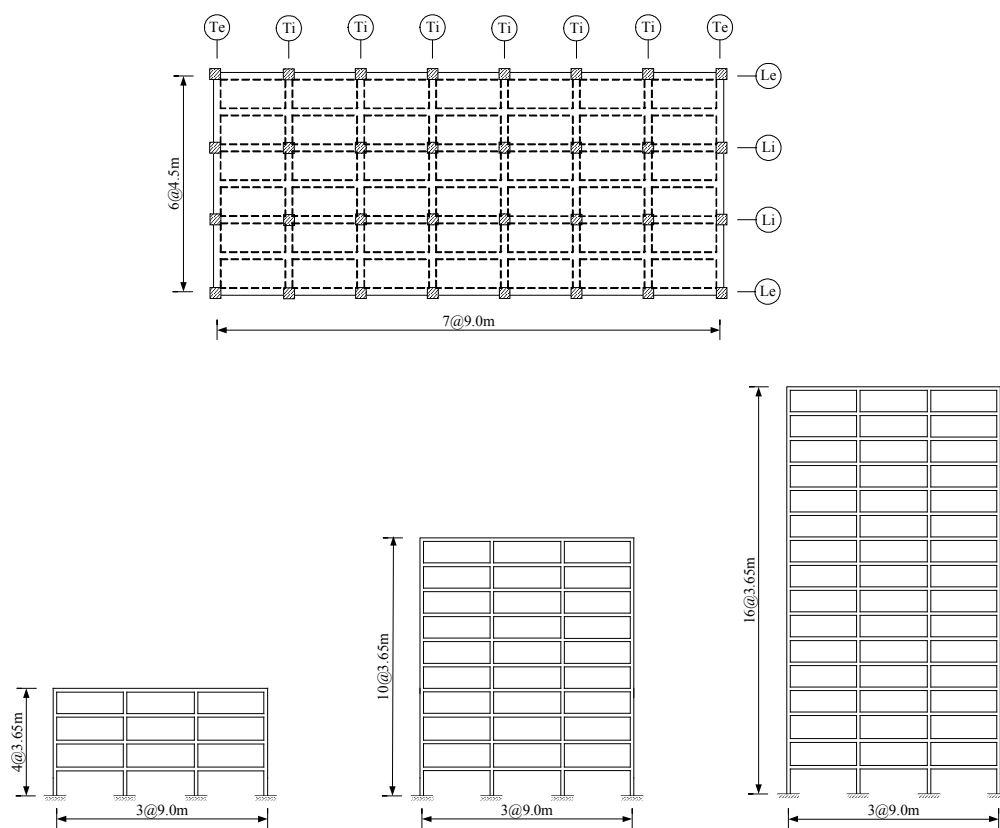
Plan of floors and elevations of transverse frames of the buildings.
